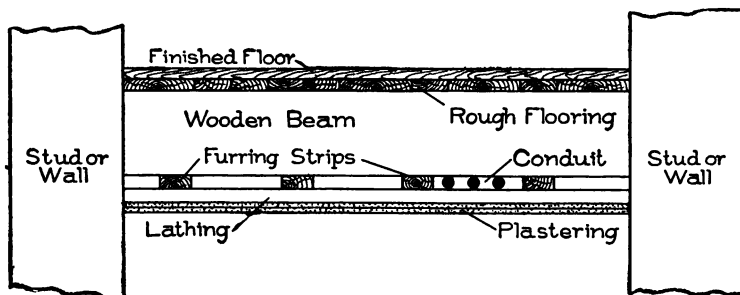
Running Conductors Concealed under Floor in Wooden Frame Building.
